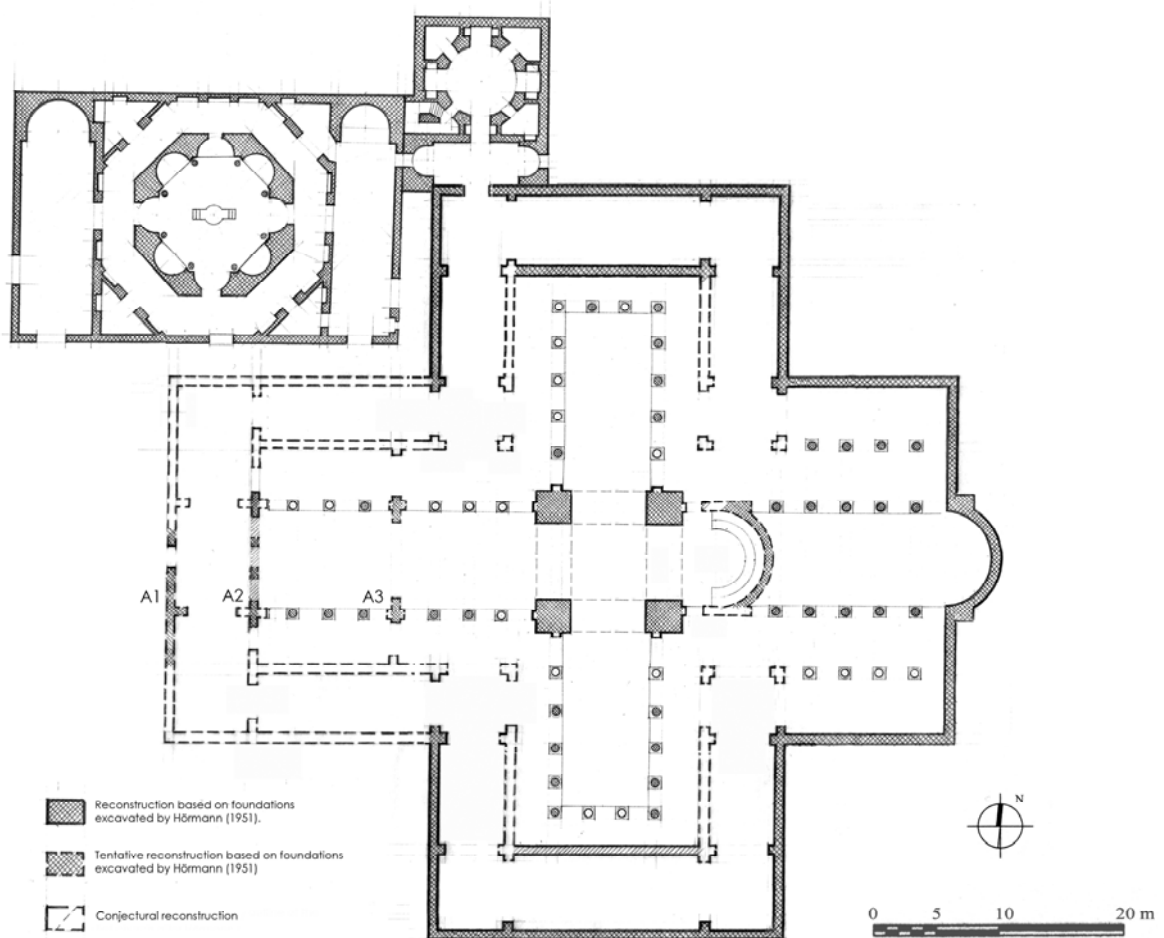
Reconstructed plan of the first church of St. John (Nikolaos Karydis, 2014).
